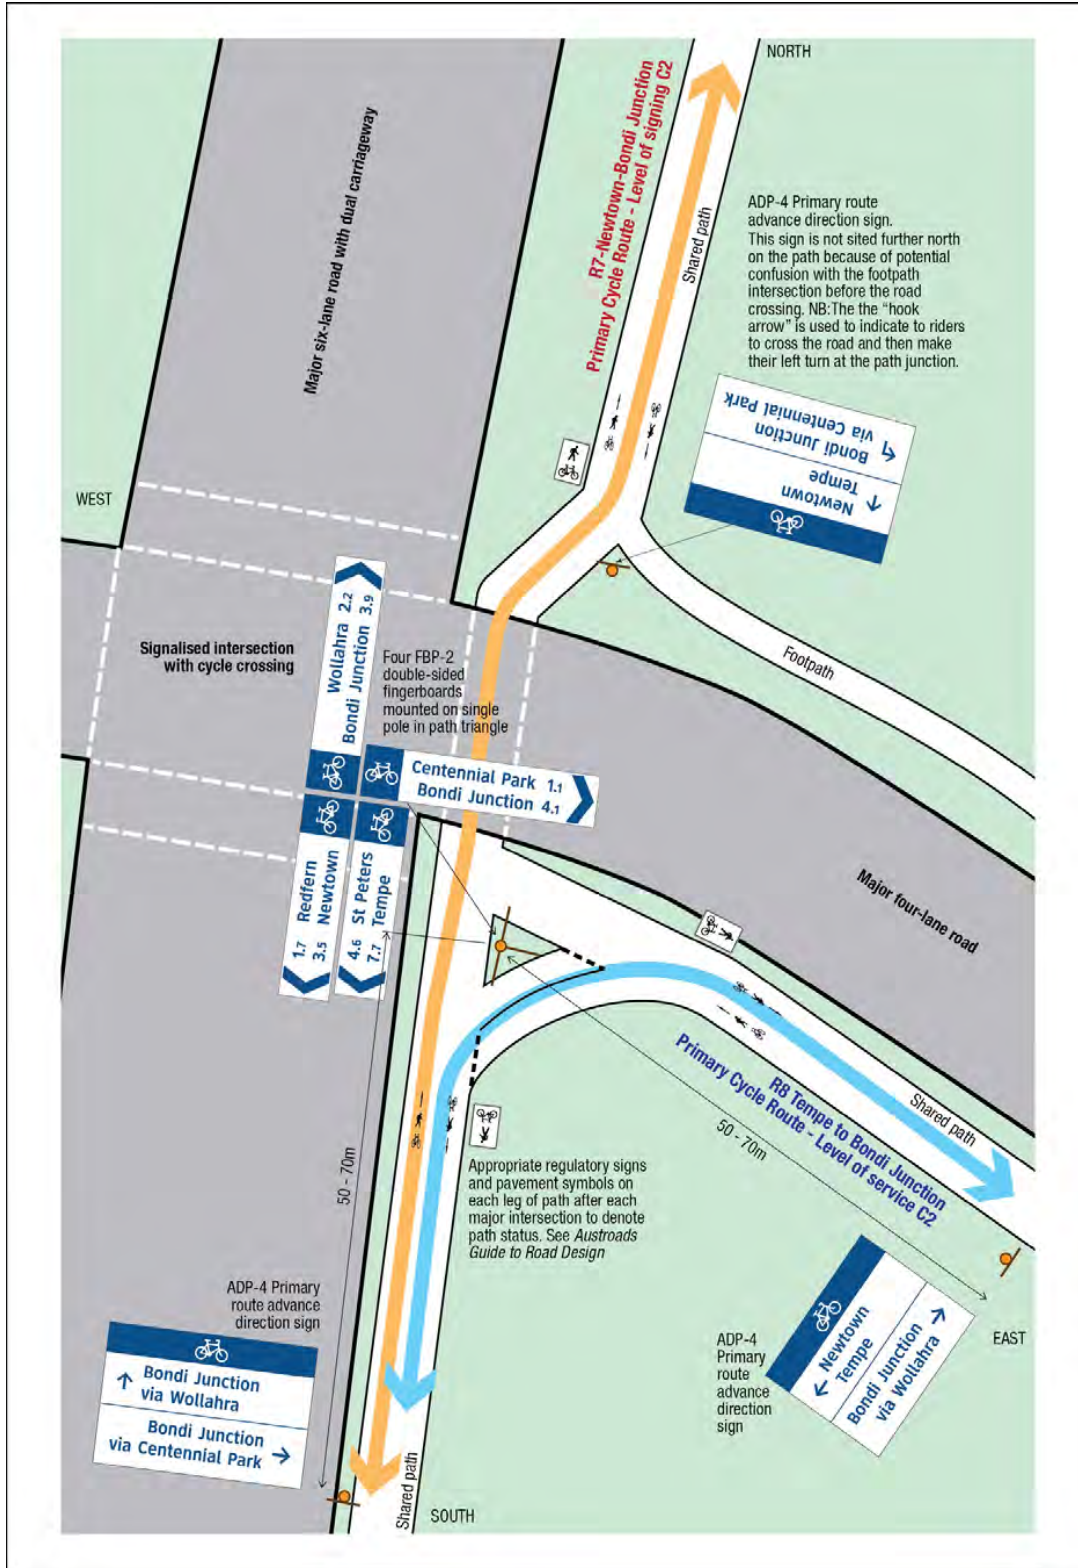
Typical intersection sign placement layout for primary/secondary transport routes.
